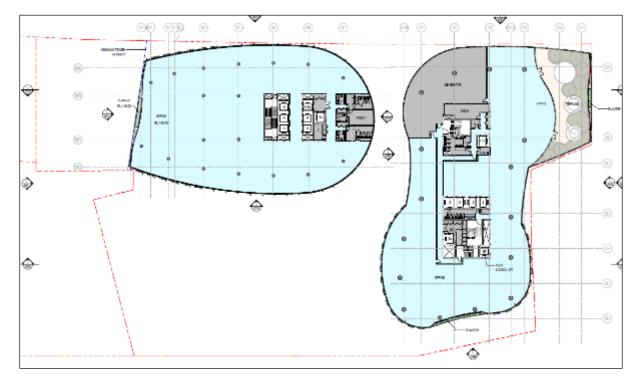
Level 33 Floor Plan and Typical Levels 28-33 High Rise Plan for North Tower
